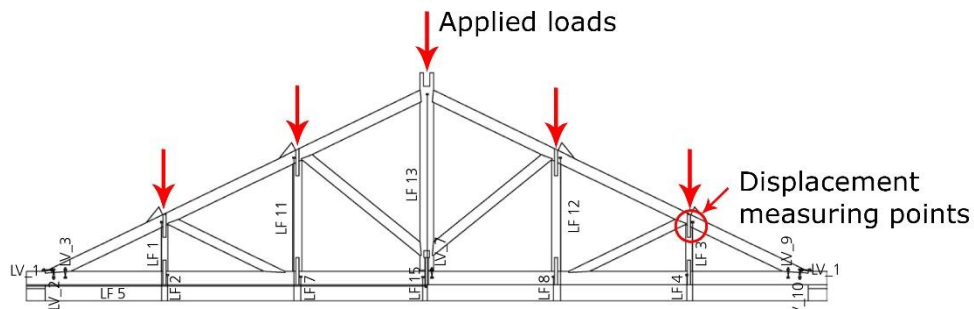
Testing layout of the Avanca factory roof truss (after [136])
